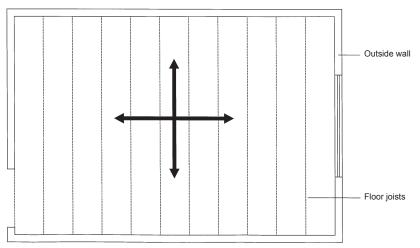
For a wood-finished floor covering, install Quik Trak panels perpendicular to the direction of the finished-wood floor boards.
